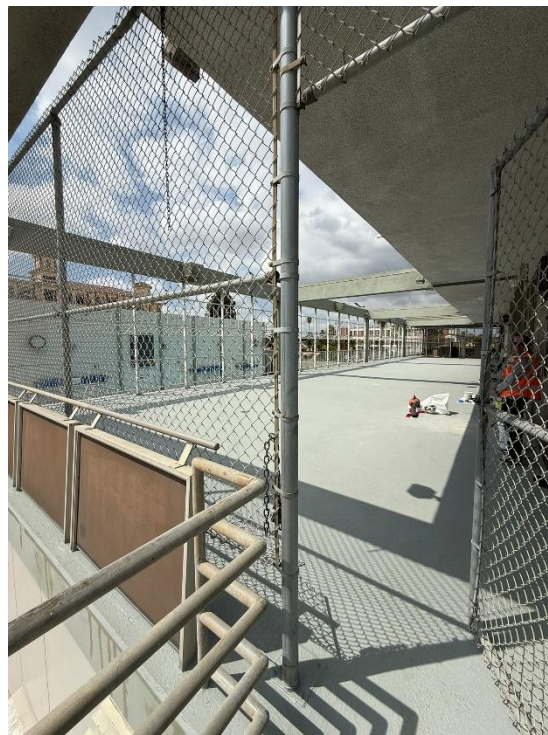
Athletics Building (F2), south elevation atrium, view southwest
